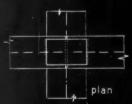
WELDED SPLICE PLATE TO ACHIEVE CONTINUITY UPPER FLANGE
